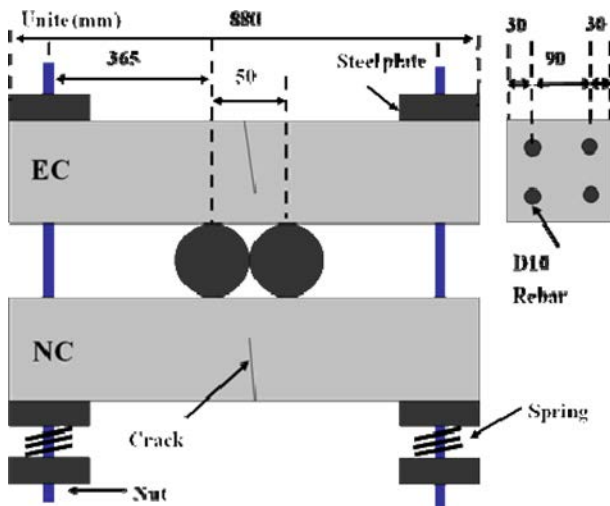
Dimensions of the test specimens in order to induce crack in concrete beam [adapted from T.Kishi *et al.* 2007].
